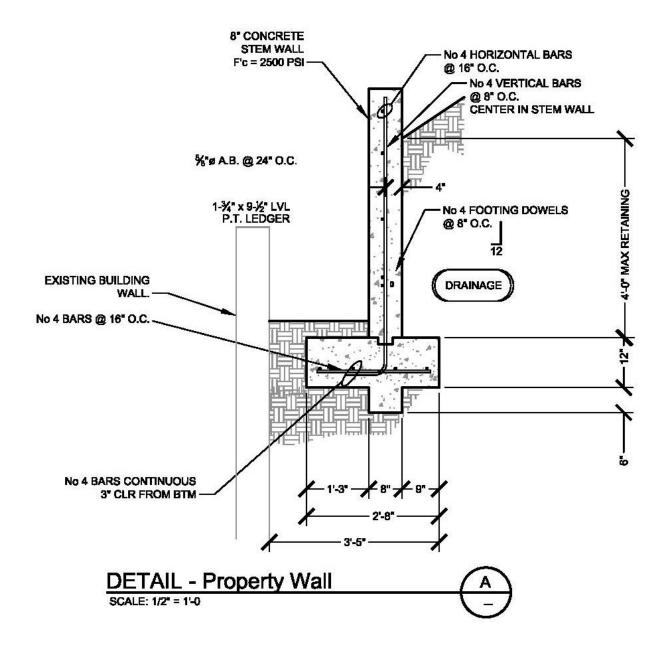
Proposed Retaining Wall, to be constructed at rear of both Winburn Way CC and Pioneer Log Cabin (Section), Snyder Engineering, 2021
